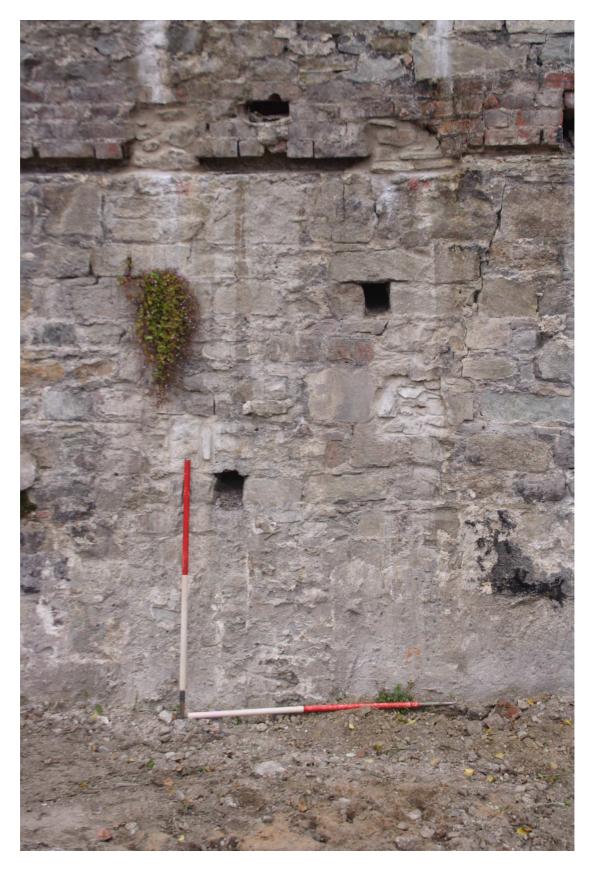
Lower section of retaining wall with putlogs visible. Floor joist slots of former cottage visible in upper image shot 4
